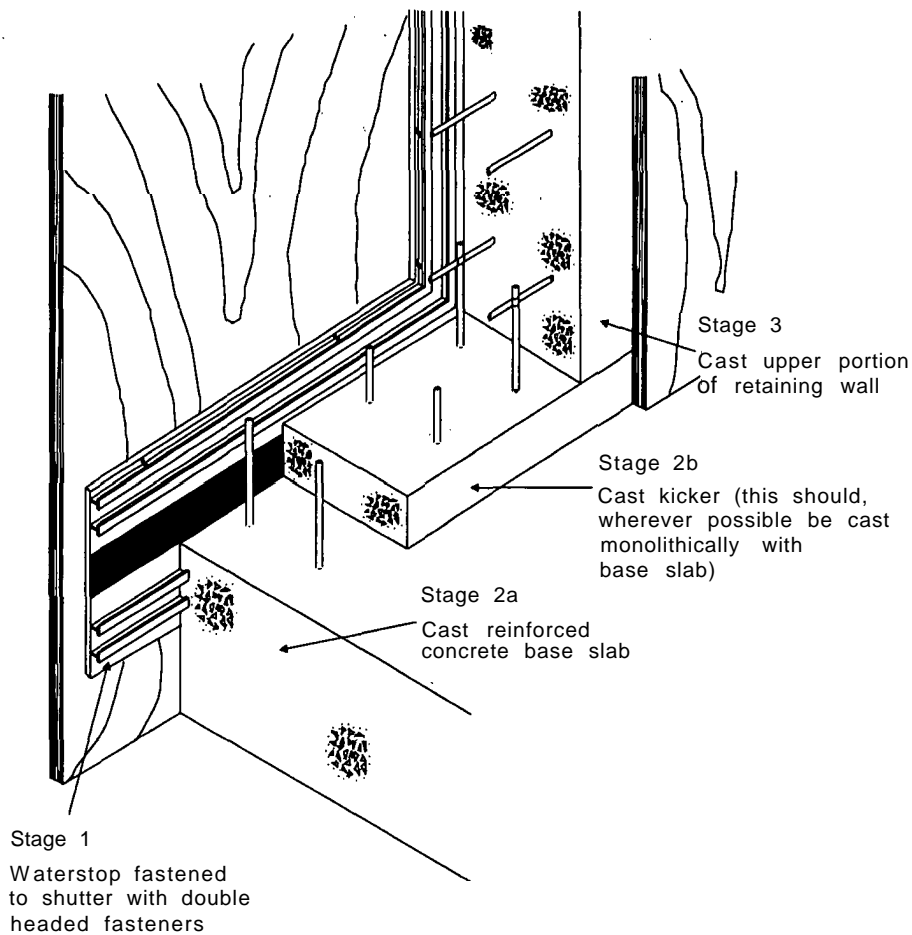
Typical detail for external waterstop at kicker of reinforced concrete retaining walls
